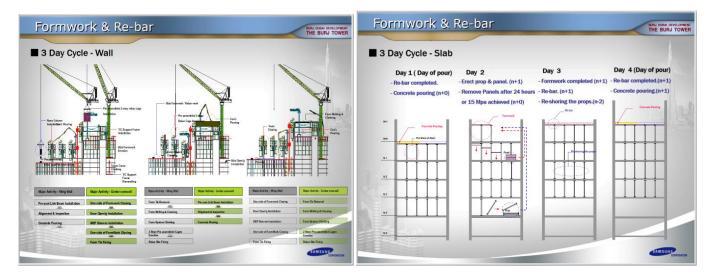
3 day Cycle for Formwork and Rebar fabrication yard
